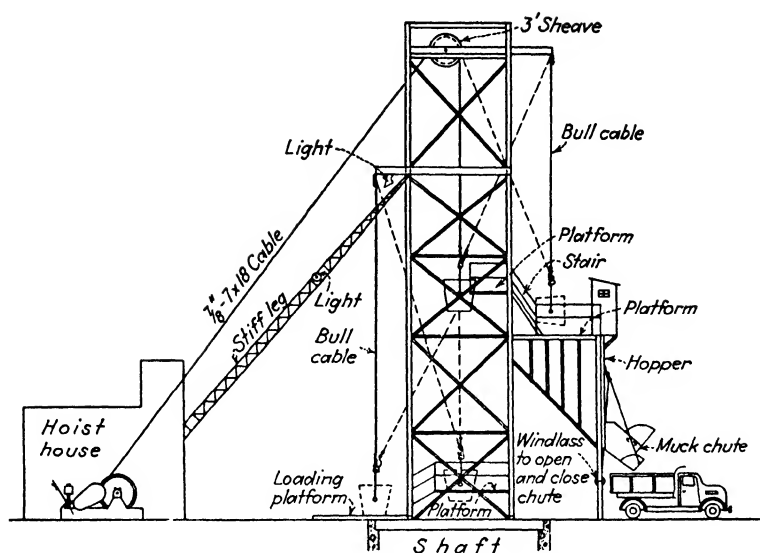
Headframe for sinking Shaft 4, Delaware River Aqueduct. Note the bull lines for swinging the bucket to side of shaft. (Courtesy Frazier-Davis Const. Co.)
